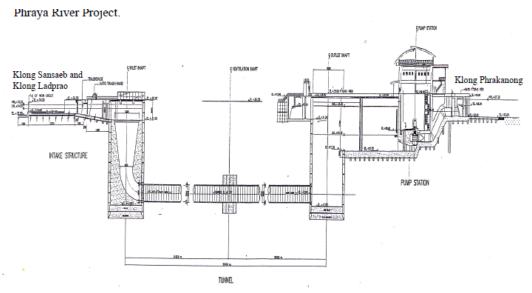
Longitudinal section of BMA water drainage tunnel project.
